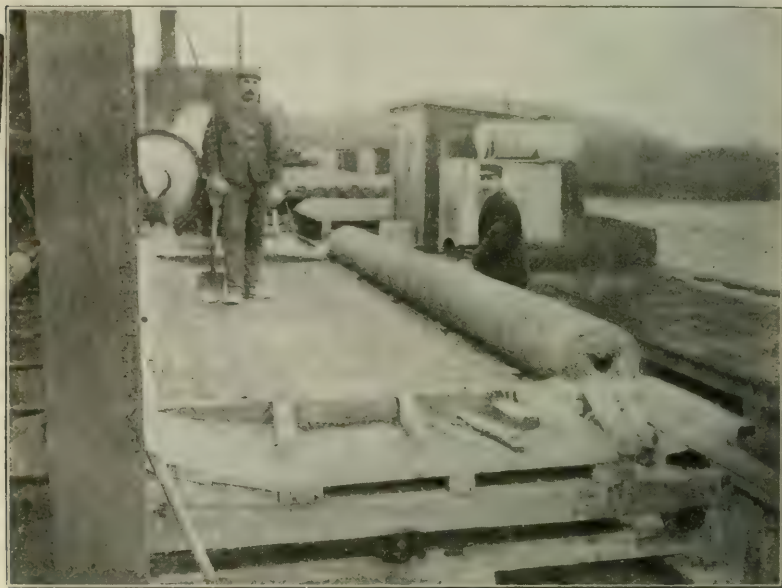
Rolled Concrete Pile, Nearly Completed.
